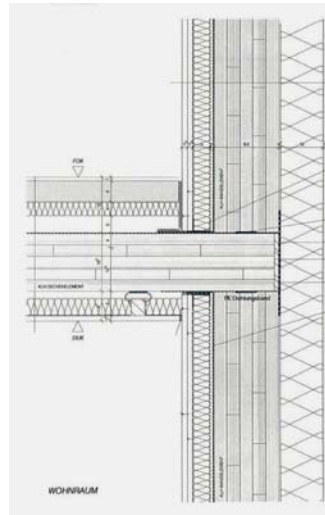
Vertical detail section of the exterior wall and a partition floor.
